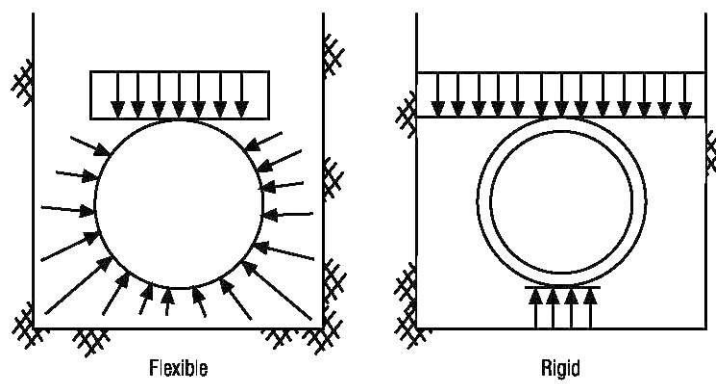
Pipe Response to Loading (Gabriel 2008)
